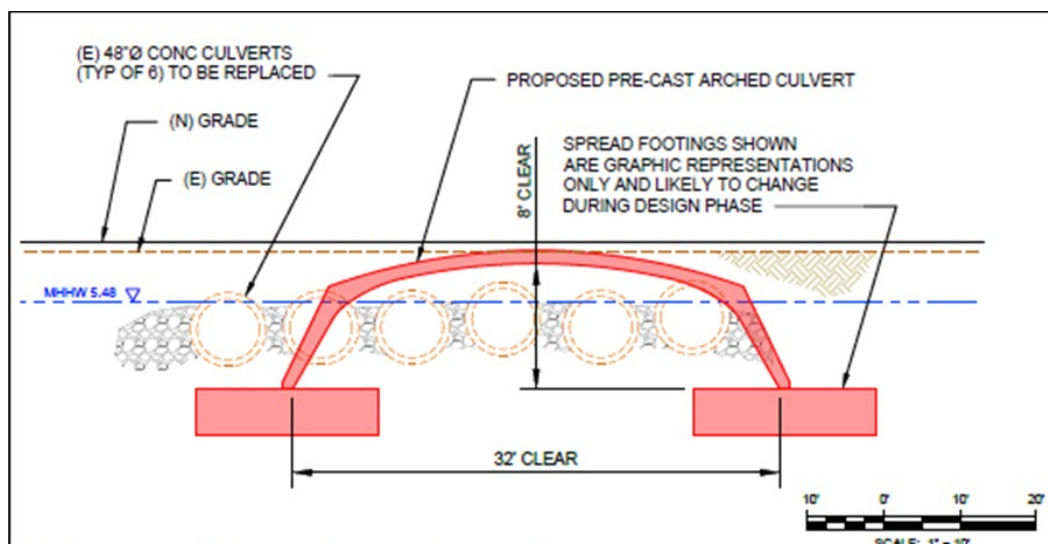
Conceptual Design of Proposed Fish-friendly Culvert
